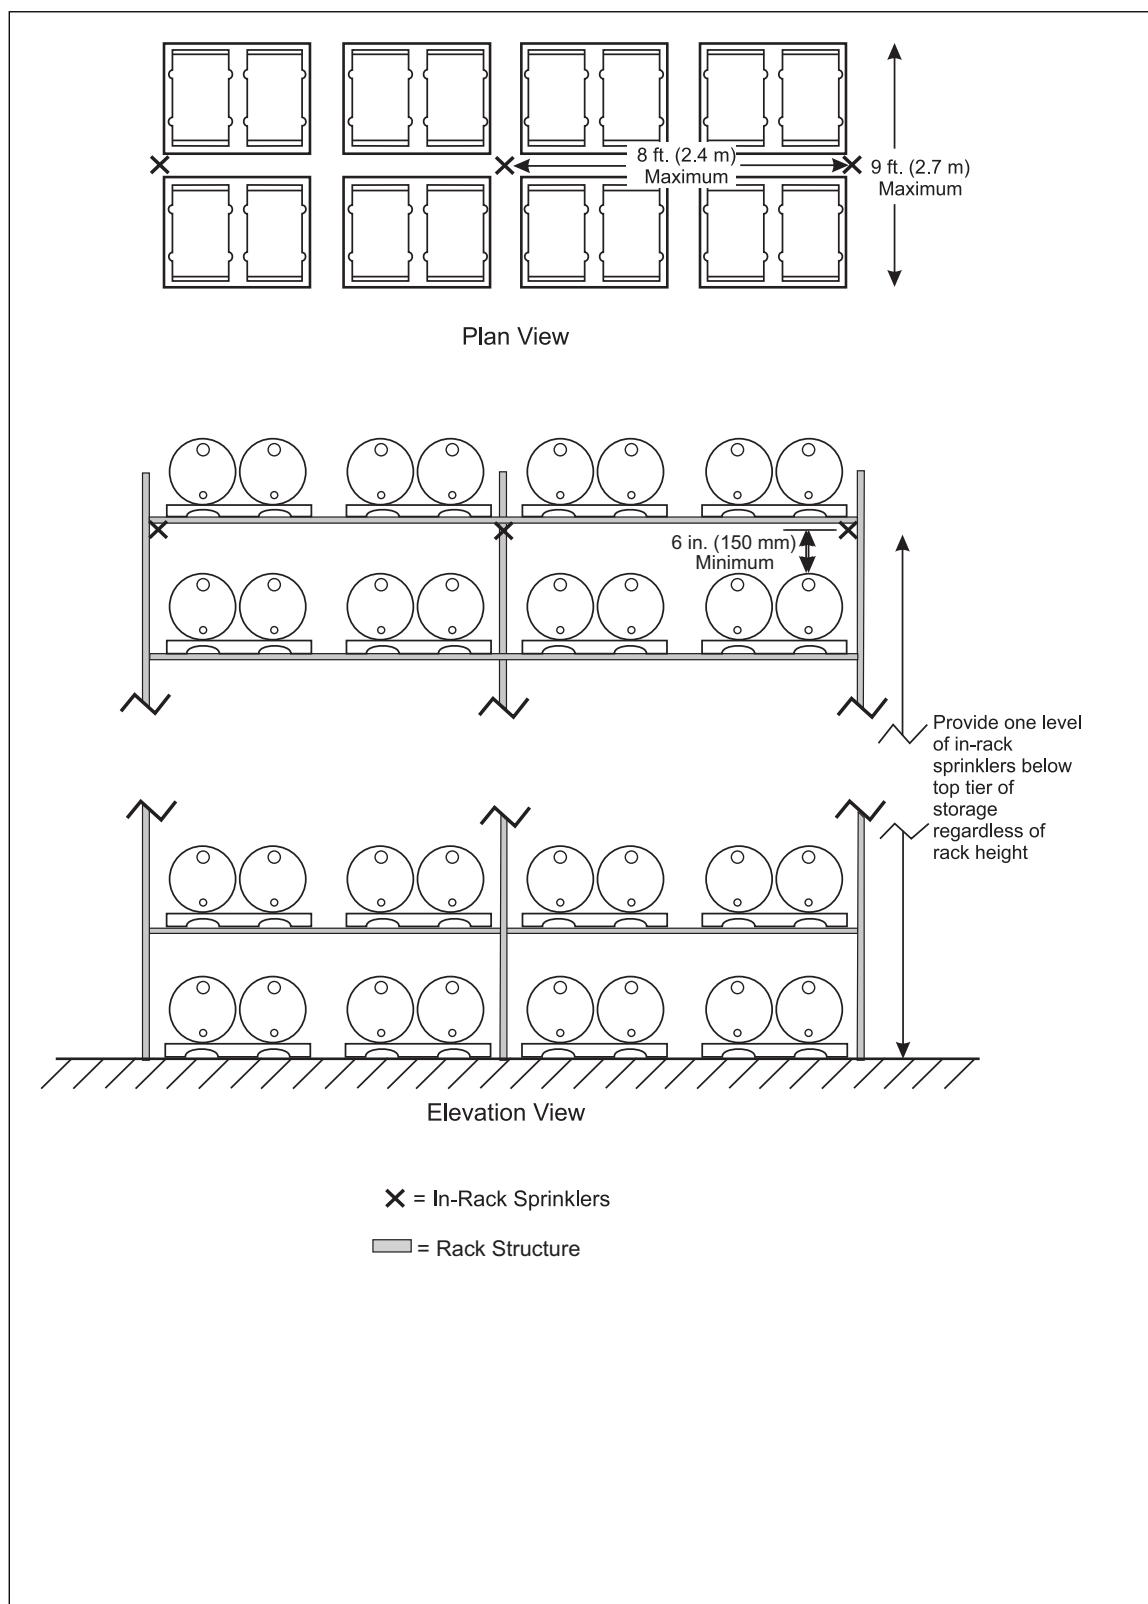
Double-row rack sprinkler layout: drum protection scheme
